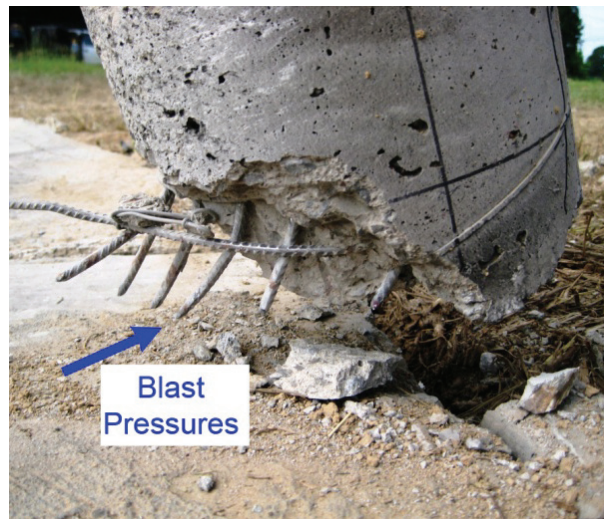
Column RC1 at Bottom (Test 1)
